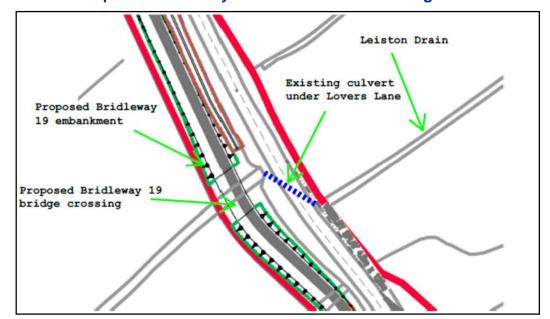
Proposed Bridleway 19 Leiston Drain Crossing
